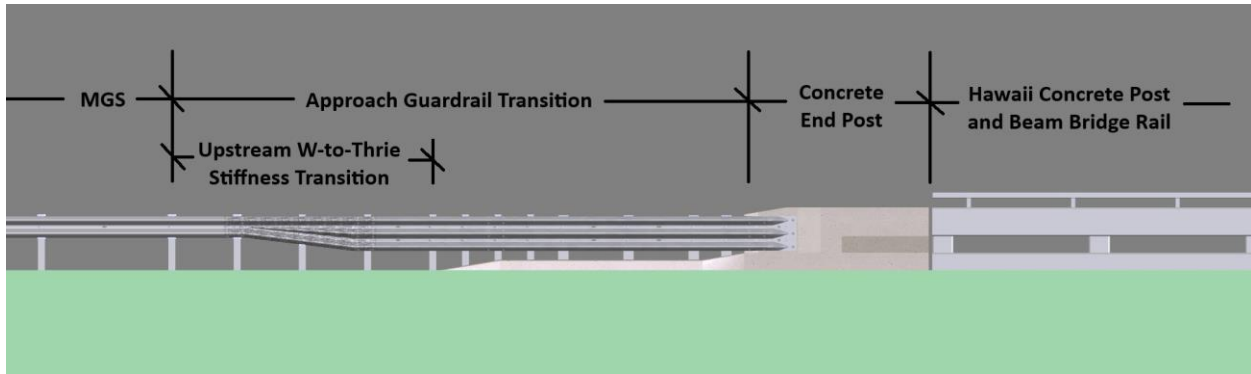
Transition Layout from MGS to Hawaii Concrete Post and Beam Bridge Rail
